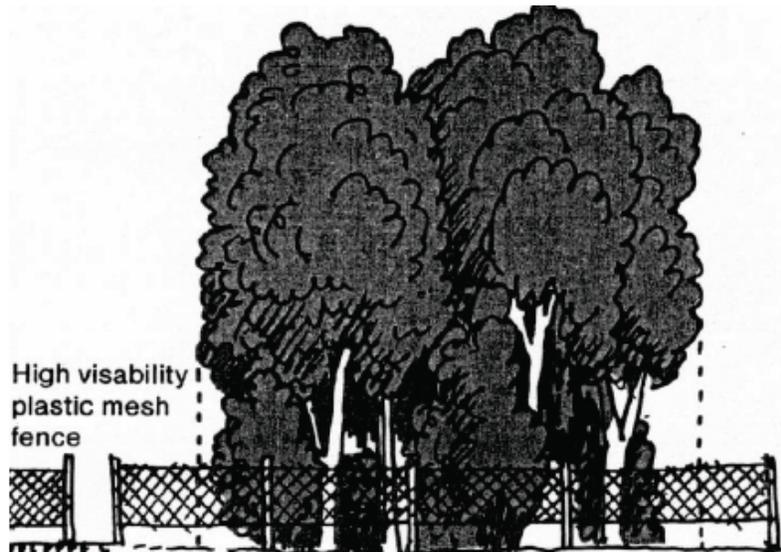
Fencing should be placed to prevent trucks and equipment from damaging tree roots.
